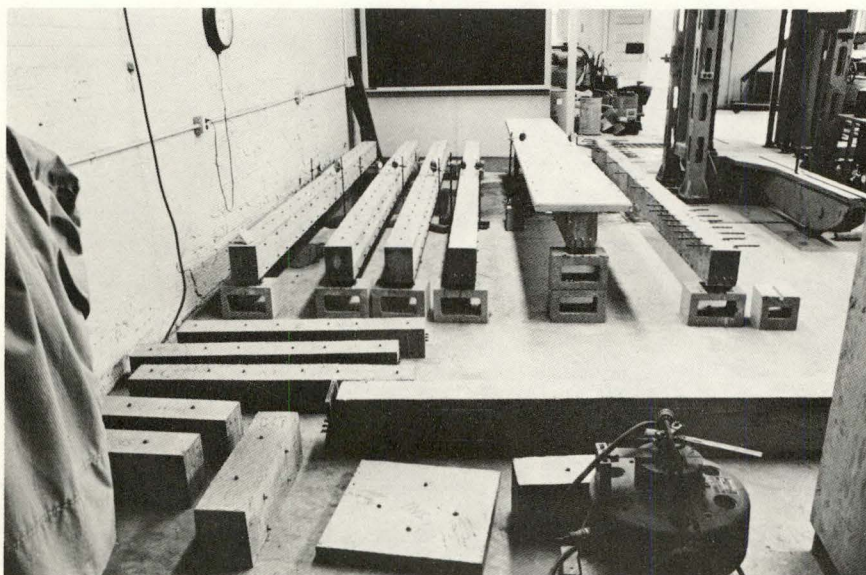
Shrinkage specimens in foreground and 7 beams (1 beam crosswise in foreground). Two additional beams in prestressing bed
